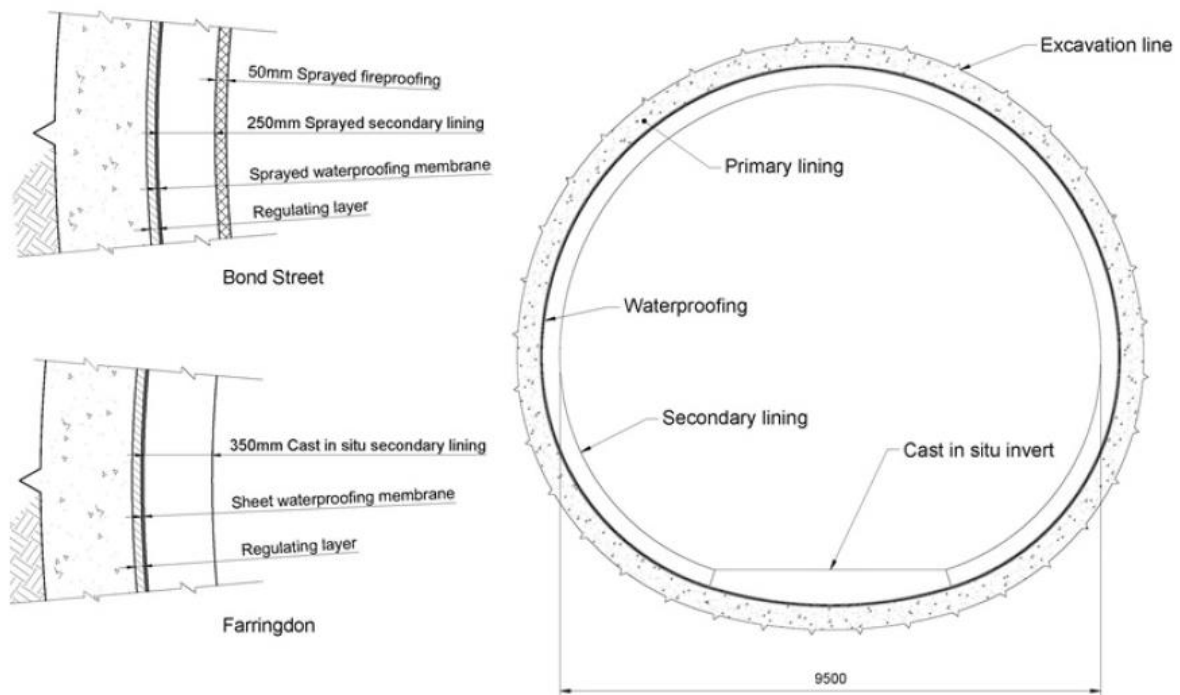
Typical cross-section of Bond Street and Farringdon platform tunnel, [42]
